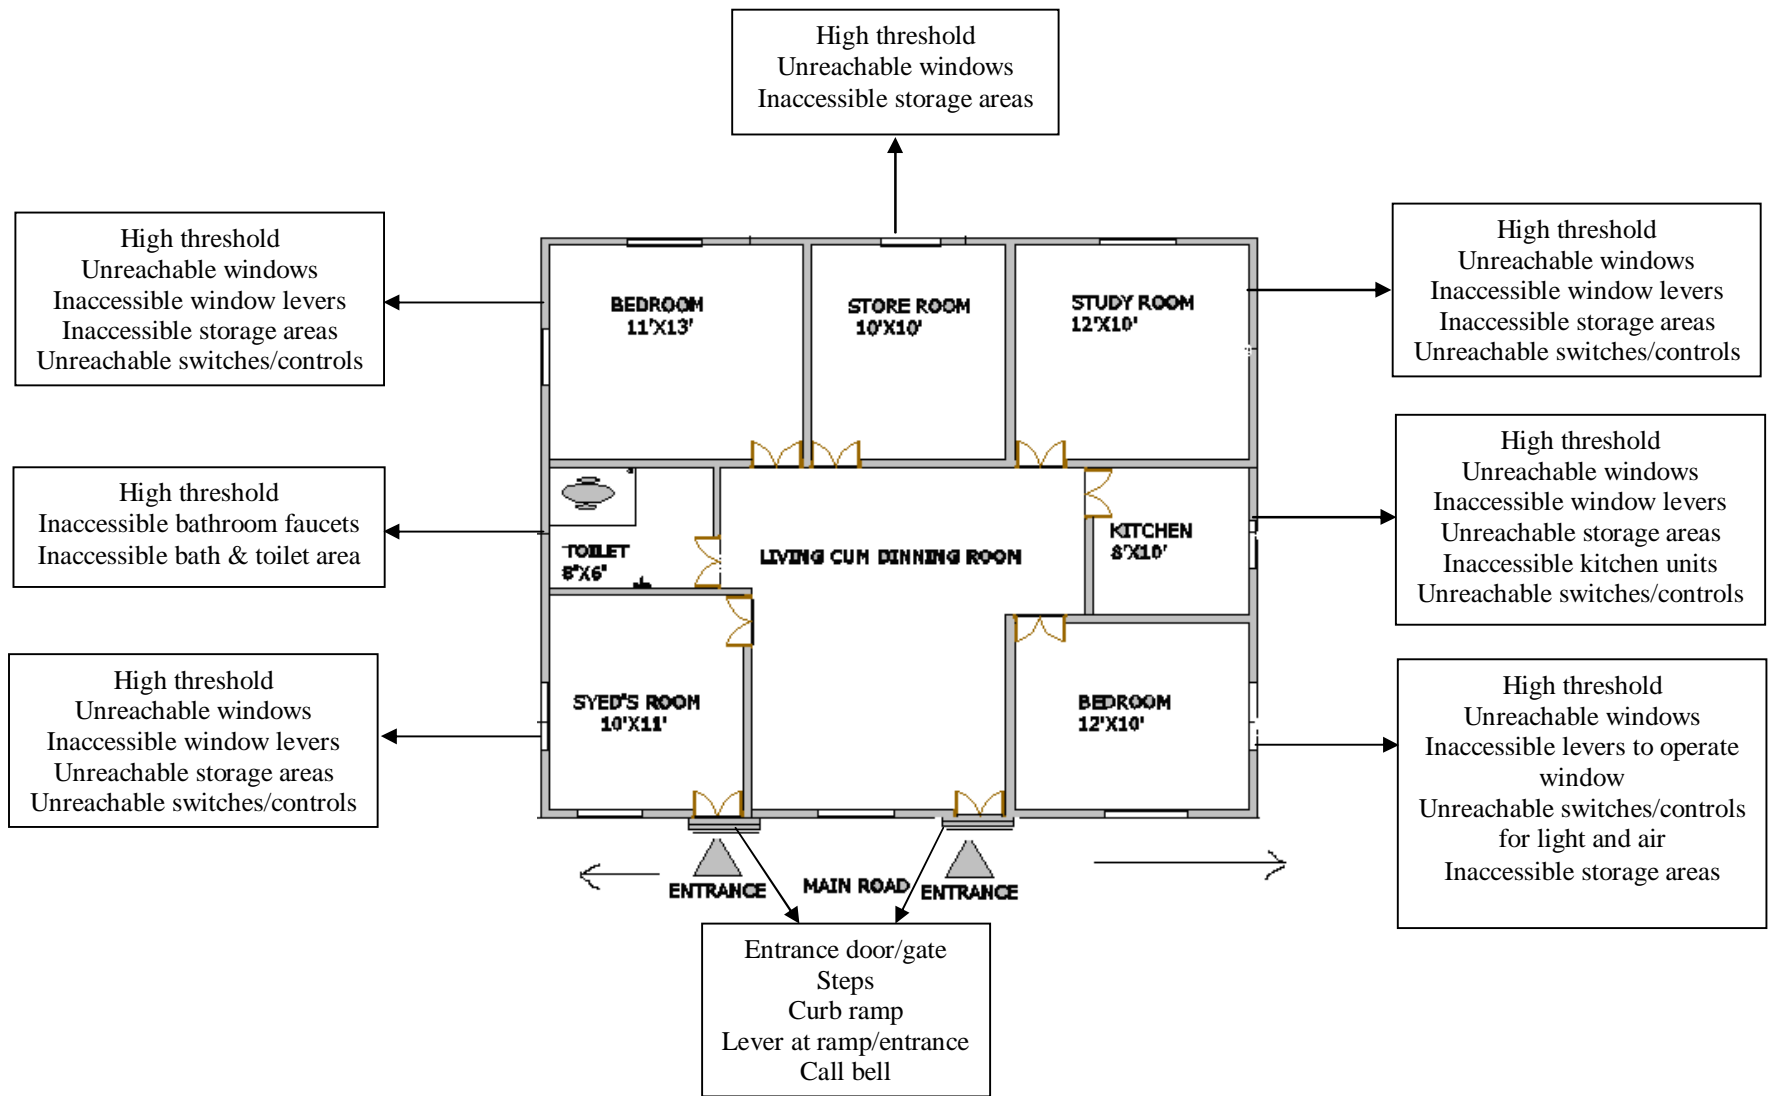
House layout of Mr. Syed showing the problem areas and features
